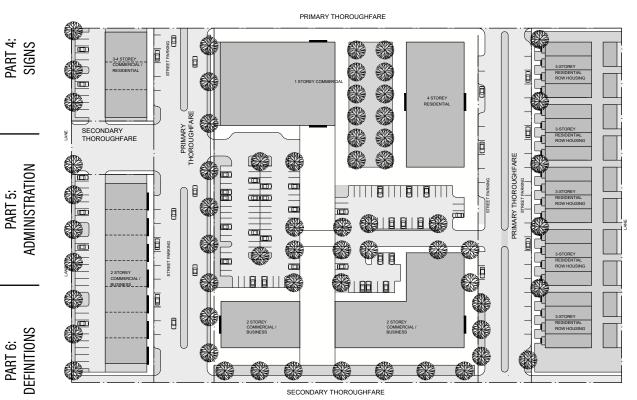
Illustrative example of Buildings and Site arrangement in the Neighbourhood Core District
